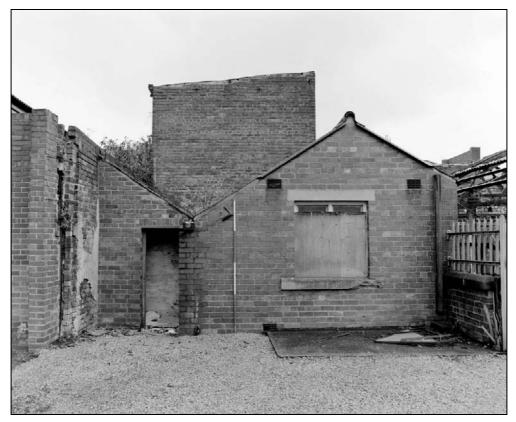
View of east elevation of wash house range, with south range beyond (film 5.10)
